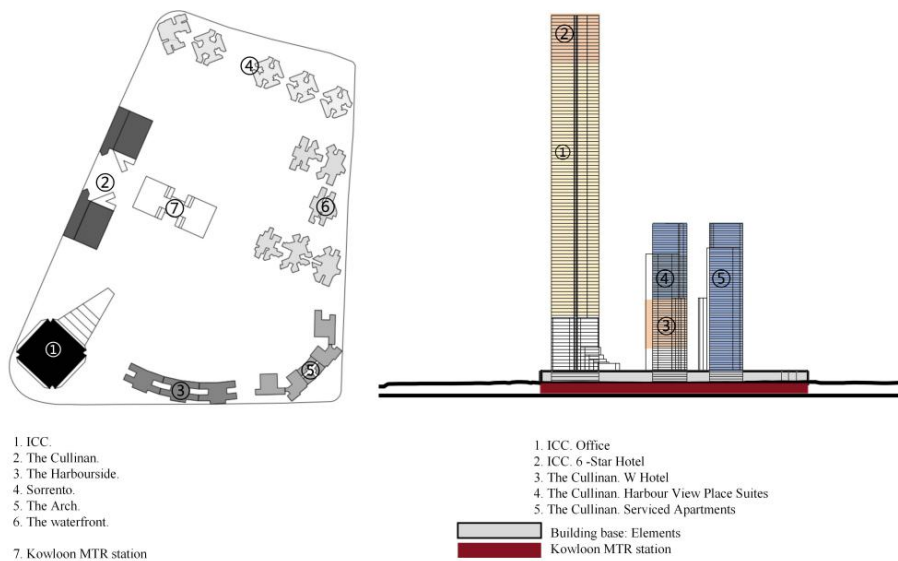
Plan and Elevation of Union Square, drawing by Yi Guo
